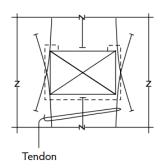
Arrangement of tendons as to prevent the formation of cracks around an opening. (Nawy, 2008)
